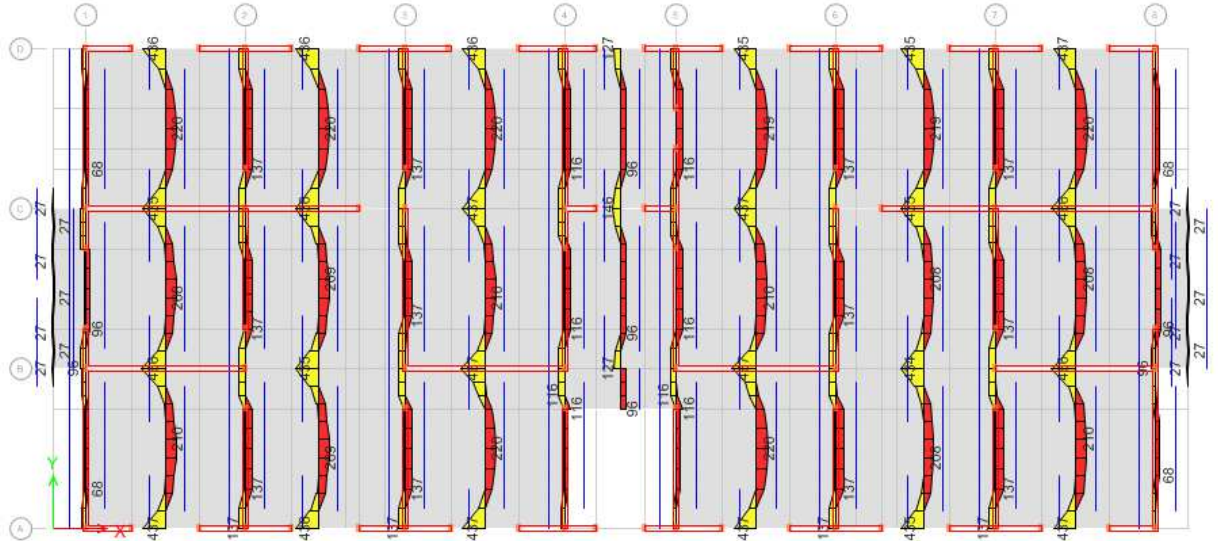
Plan of the slab. 1st floor. Layer B. Top and bottom reinforcement
